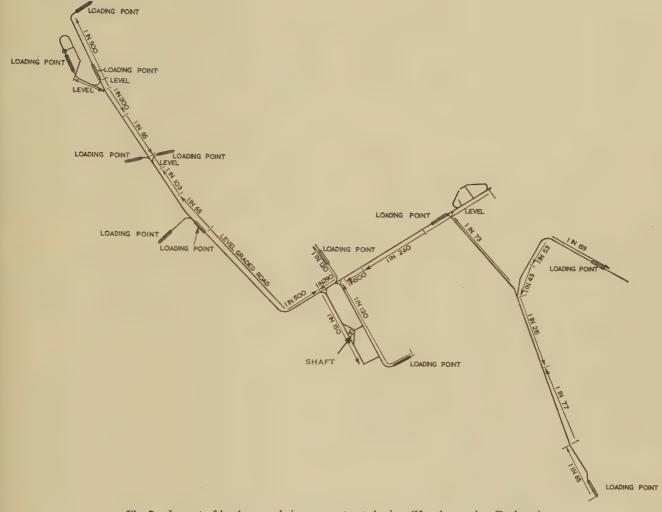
Layout of haulage roads in a reconstructed mine. (Hawthorn mine, Durham.) The arrows point downhill.
